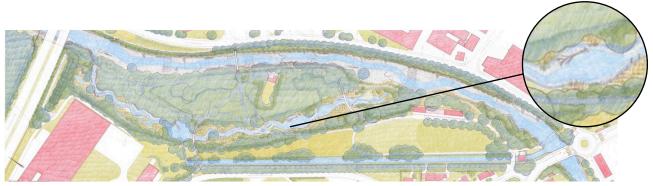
Landscape Plan (Klauser, edited by Heinkelmann)
